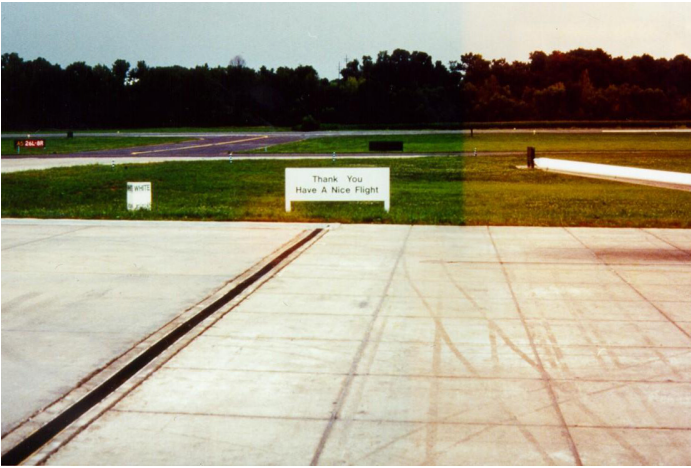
Photo of the completed concrete overlay at Spirit of St. Louis Airport in 1994
